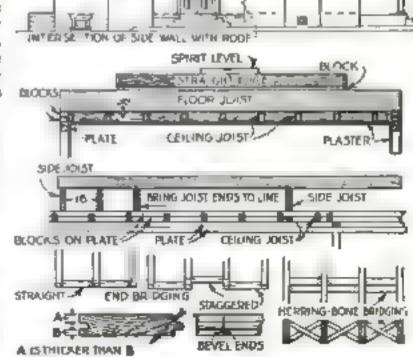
at right House with edded atticroom and details showing methods of setting and bracing foor joints bridging and laying the floor
